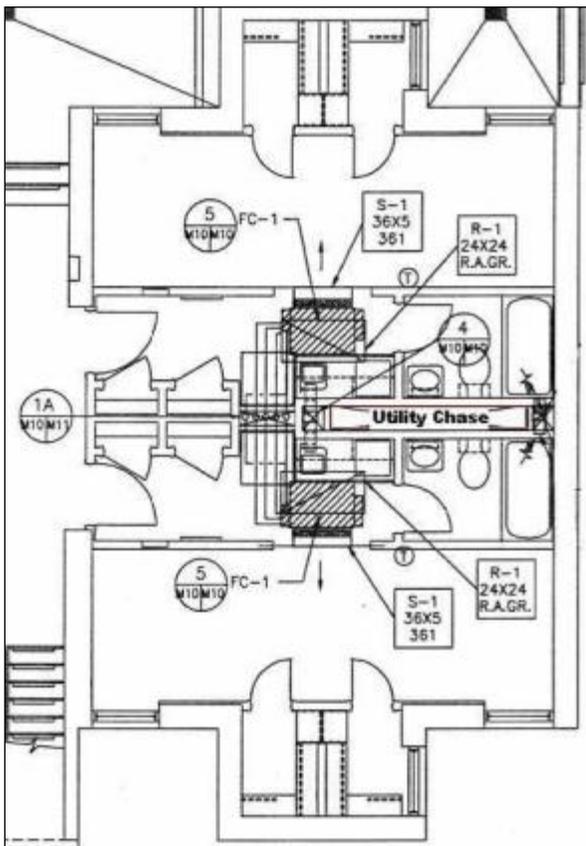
Floor plan of occupant rooms (two rooms shown).
